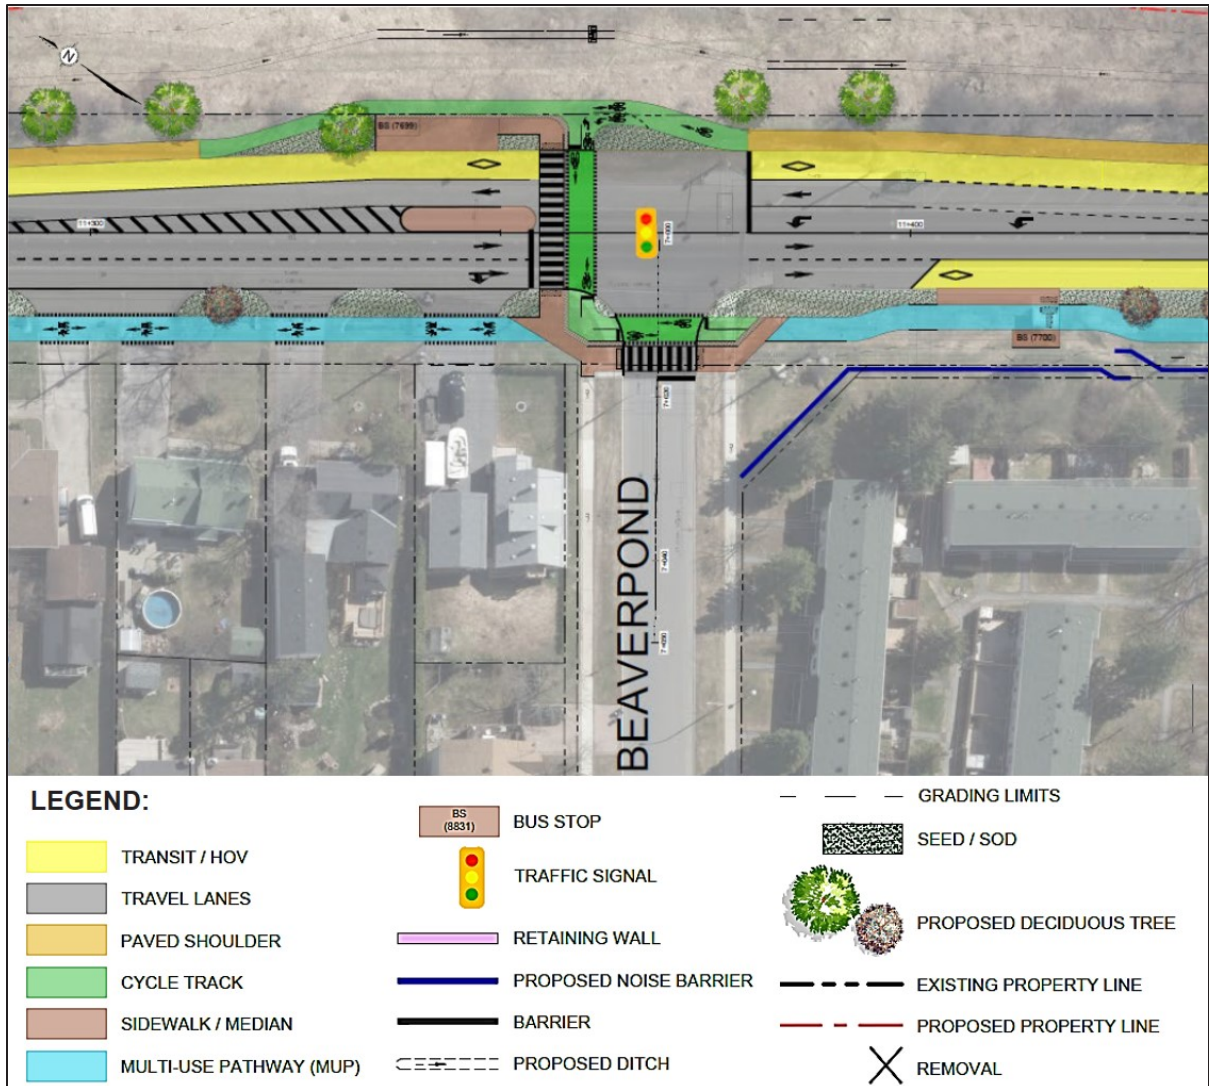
Recommended Design at Beaverpond Drive Intersection
